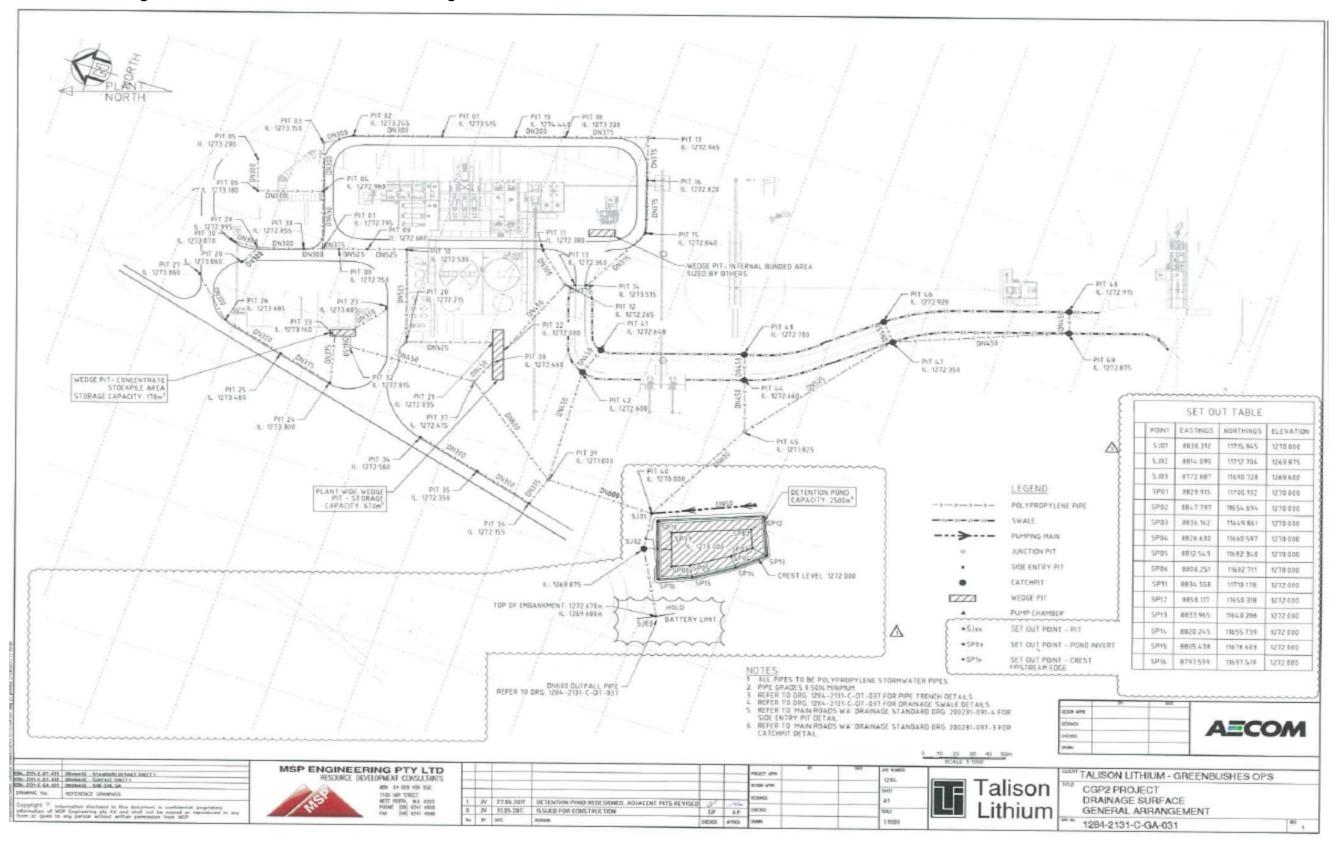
Surface stormwater drainage plan - Chemical Grade Processing Plant
